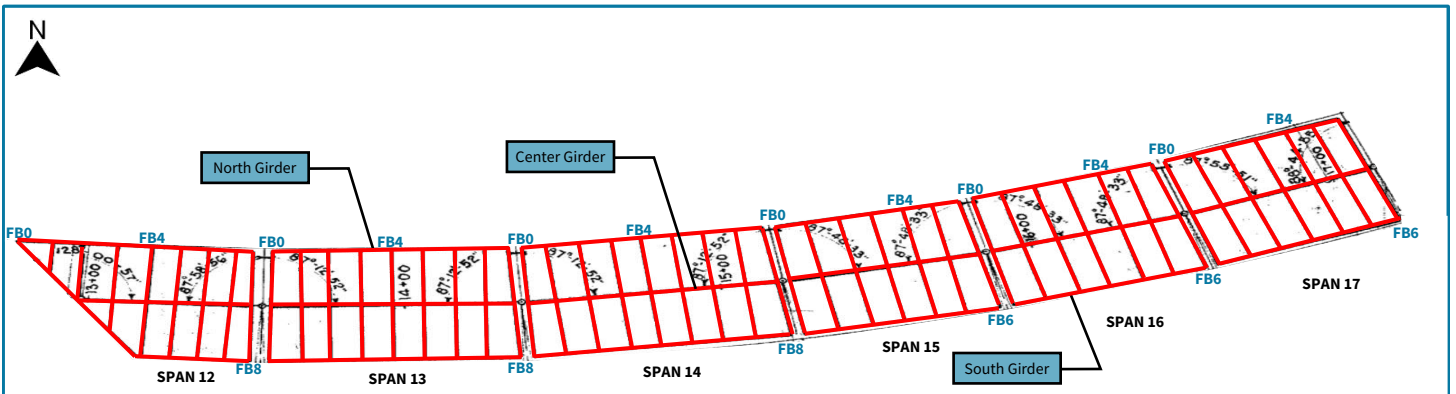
HAM-50-2180N Bridge Nomenclature (Framing Plan Layout and NSTMs - Spans 12 to 17)
